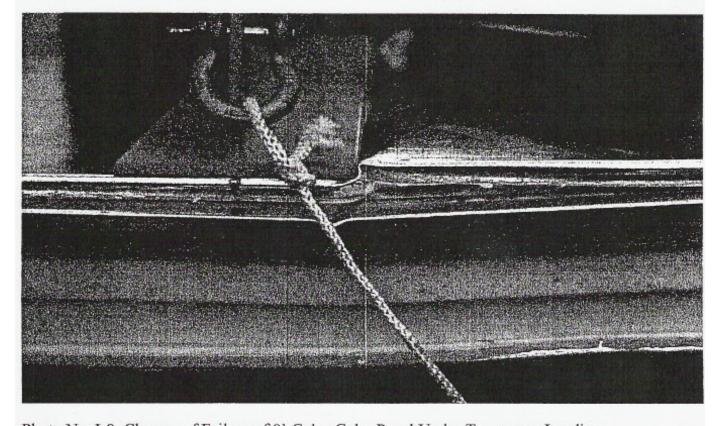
Closeup of Failure of 8' Galv.-Galv. Panel Under Transverse Loading
